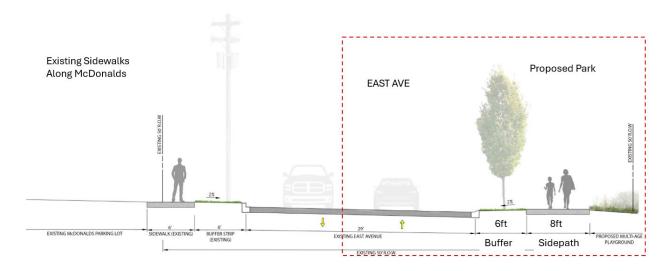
East Avenue frontage improvements, looking south along proposed park frontage
